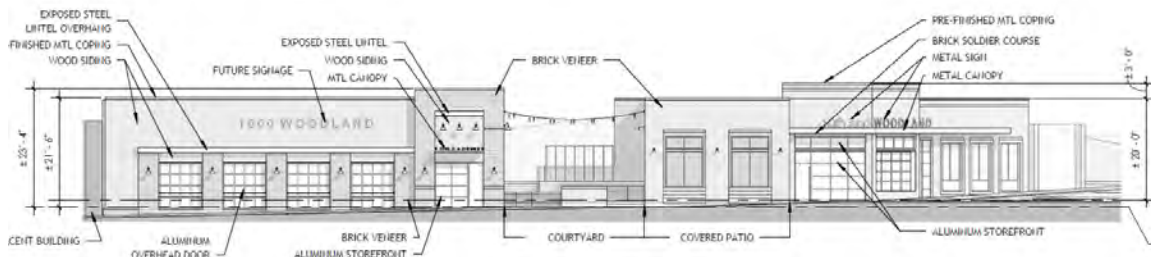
Woodland Street elevation showing the two proposed commercial infill buildings.
